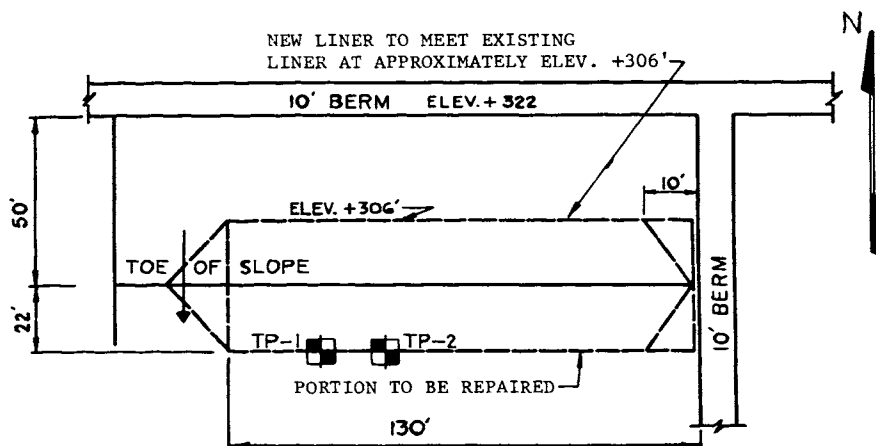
PLAN VIEW OF THE CENTRAL PORTION OF THE NORTH SLOPE SHOWING CONDITIONS AND THE EXTENT OF REMEDIAL WORK TO BE DONE.
